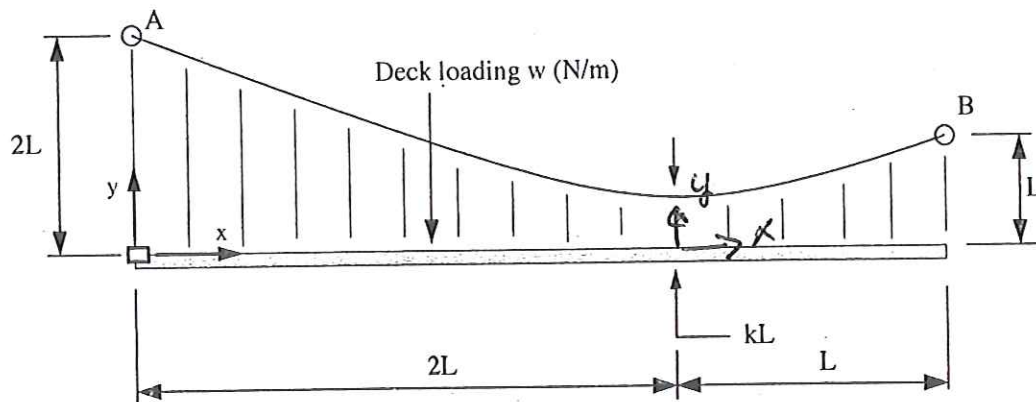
Elevation view of a single cable span in a suspension bridge (not to scale).
